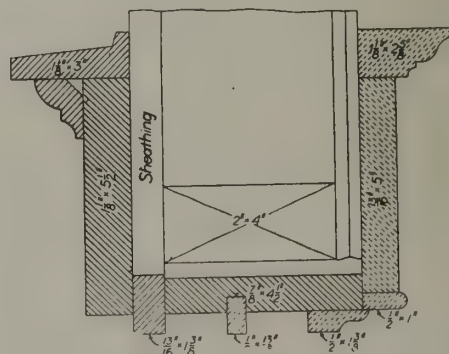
Horizontal Section Through Window Head, Showing Style of Trim
